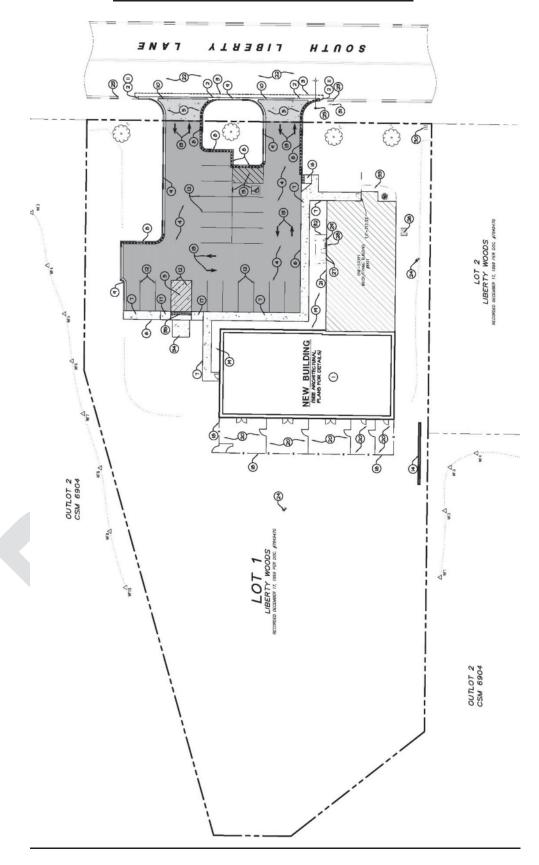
EXHIBIT A: CONCEPT SITE PLAN (ENLARGED)
